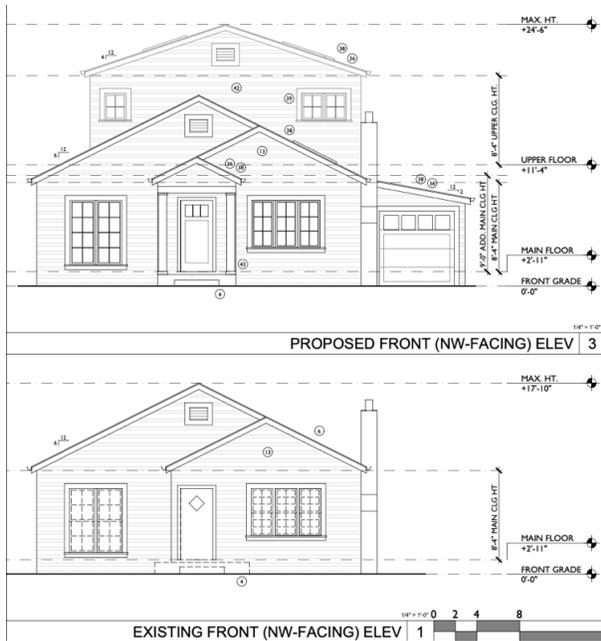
Proposed & Existing Front Elevation - 642 Park Ct.
